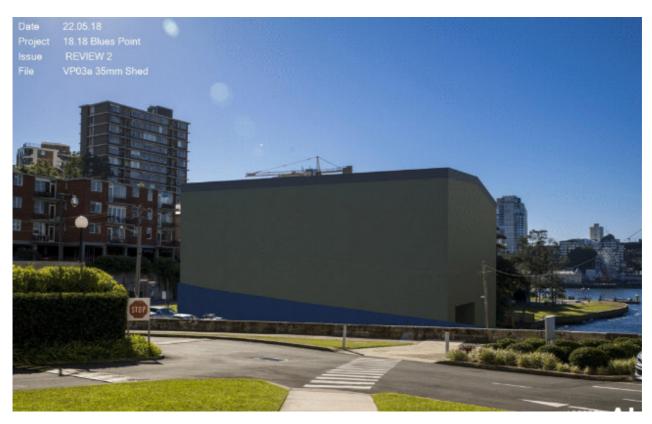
Photomontage of proposed temporary acoustic shed from the ground floor of Blues Point Tower
